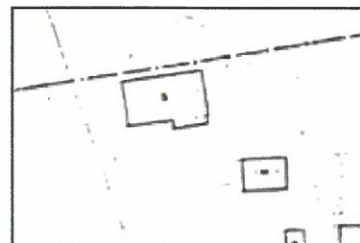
The 1929 plan showing the house Lanosa, surrounding outbuildings including the brick stable which is shown with a projecting bay (possibly with gabled roof indicated by the shadow line) at the south eastern corner of the building.
